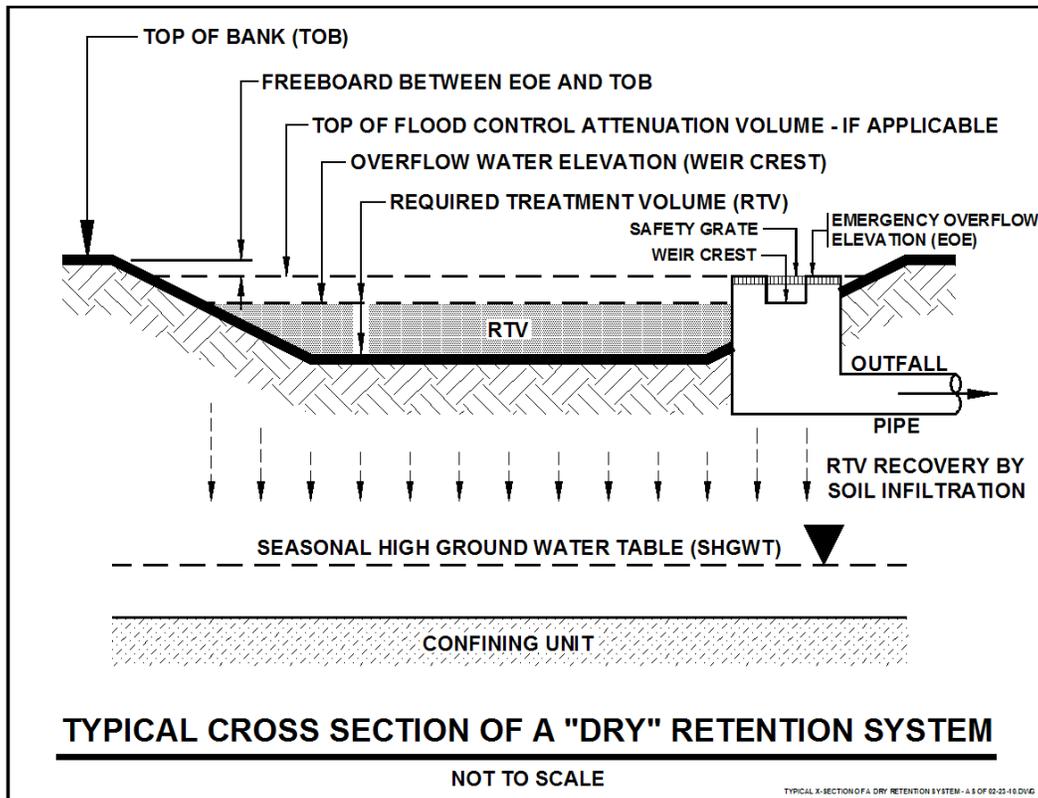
Typical Cross-Section of a “DRY” Retention Pond
